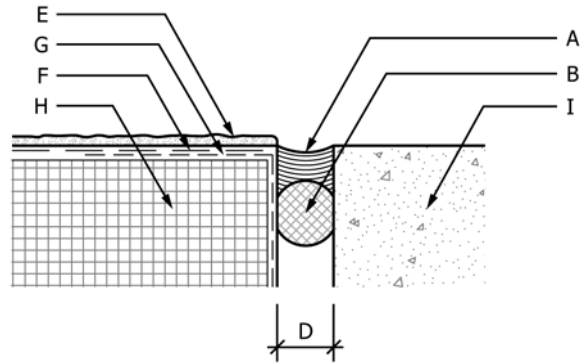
Sealant Butt Joint Seal (EIFS to Dissimilar Substrates)
